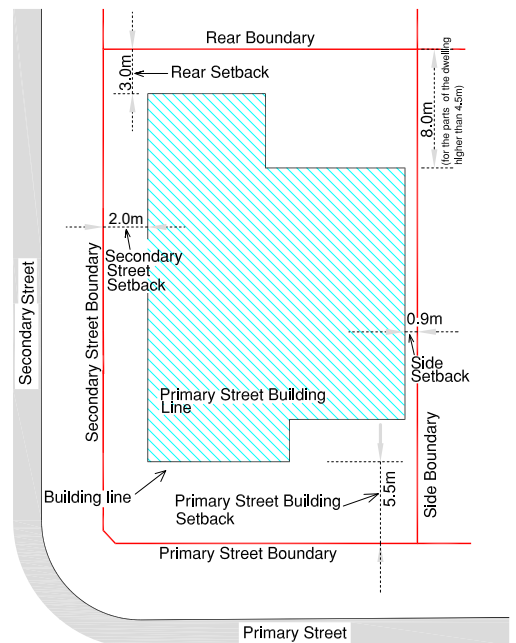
Illustration of the required setbacks for dwelling houses under the Plan
